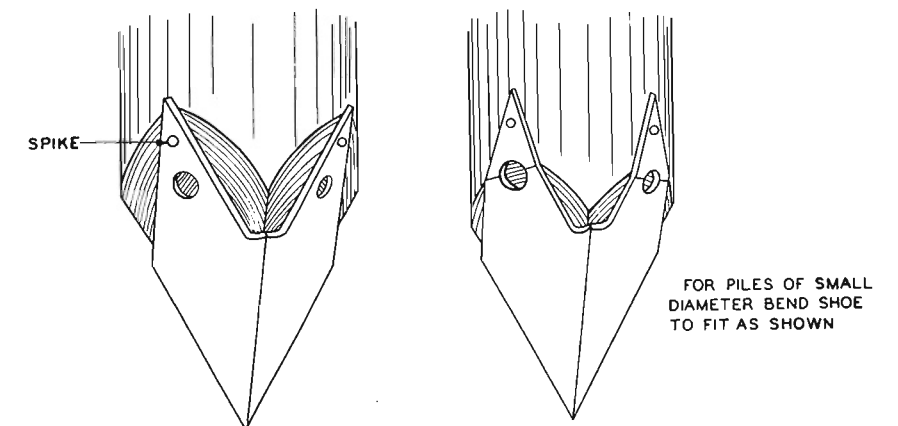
Steel pile shoe used to protect tips of timber piles in hard driving.
